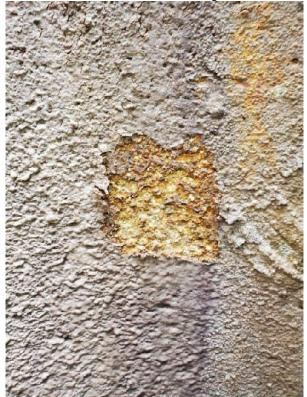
MH 80 Top Riser Section Wall Condition – Growth Removed
